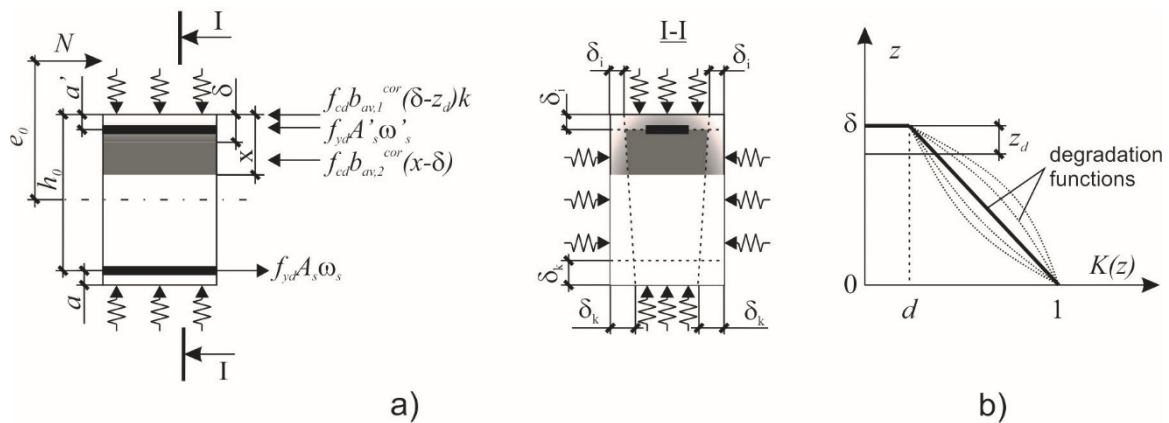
Scheme for the structural analysis of an eccentrically compressed corrosion-damaged reinforced concrete column (a), a general view of the degradation functions for the corroded concrete [7]
